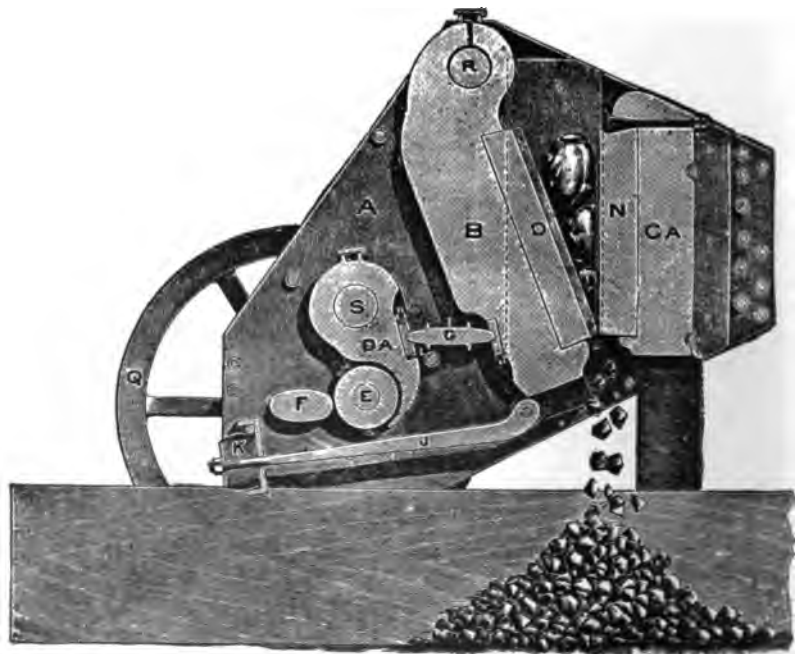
THE CHAMPION CRUSHER. SECTIONAL VIEW.
